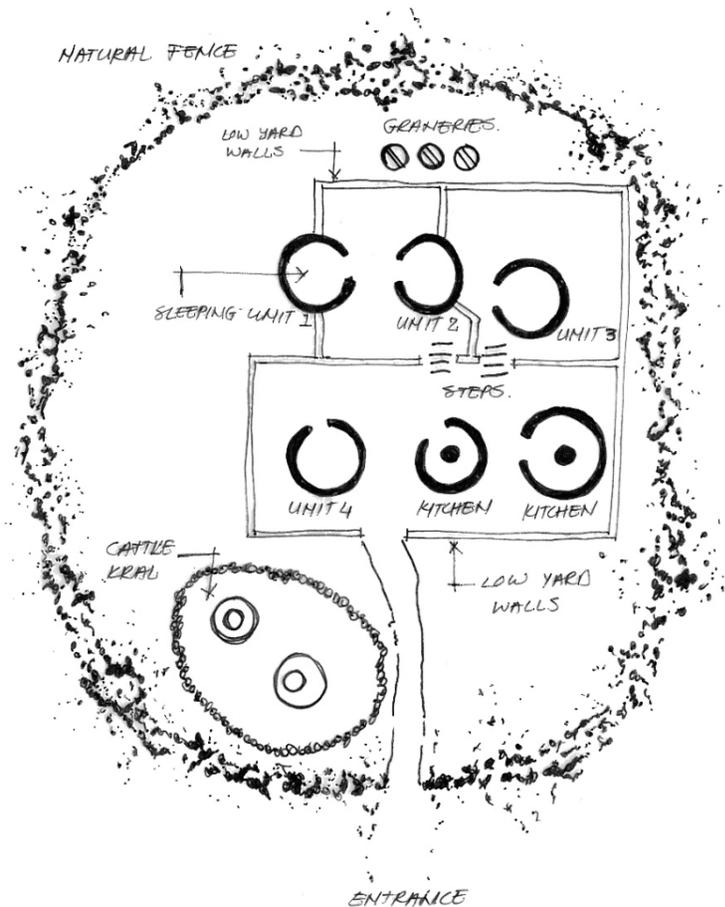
'Kraal' plan layout
